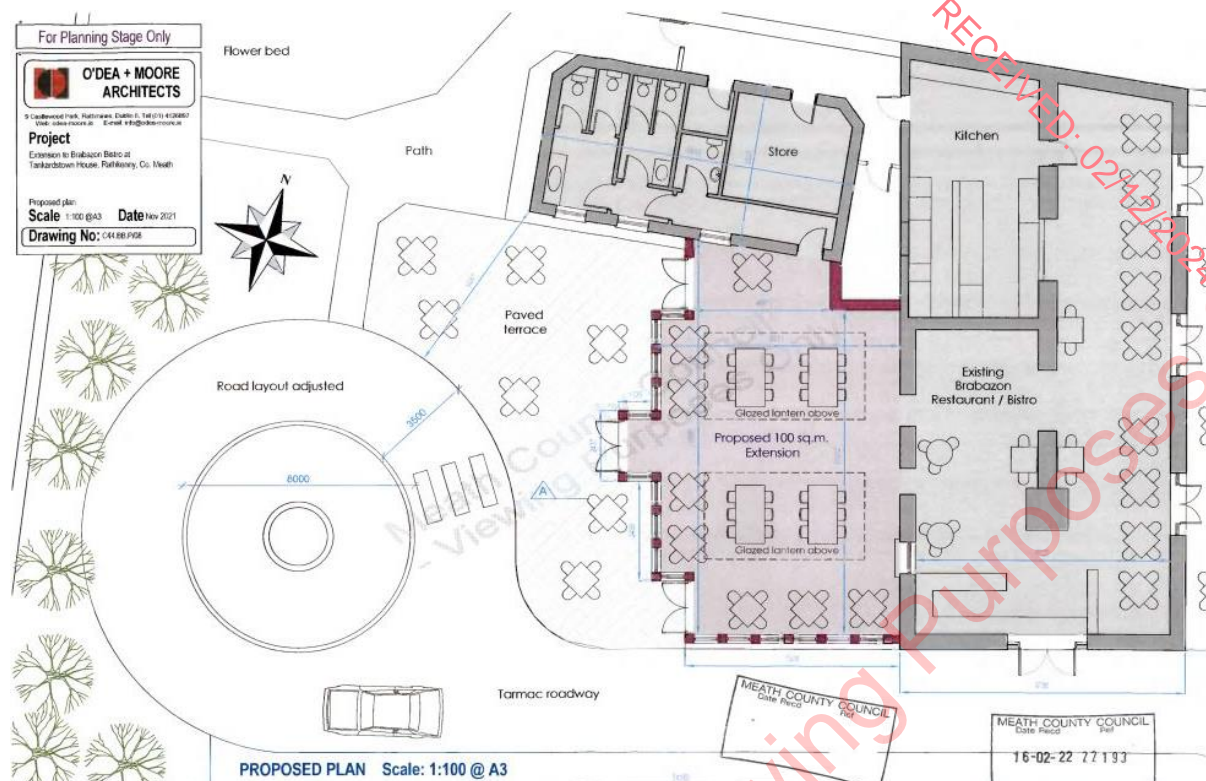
Proposed layout plan submitted and approved under Reg. Ref. 22193 featuring an extension to the existing restaurant.
